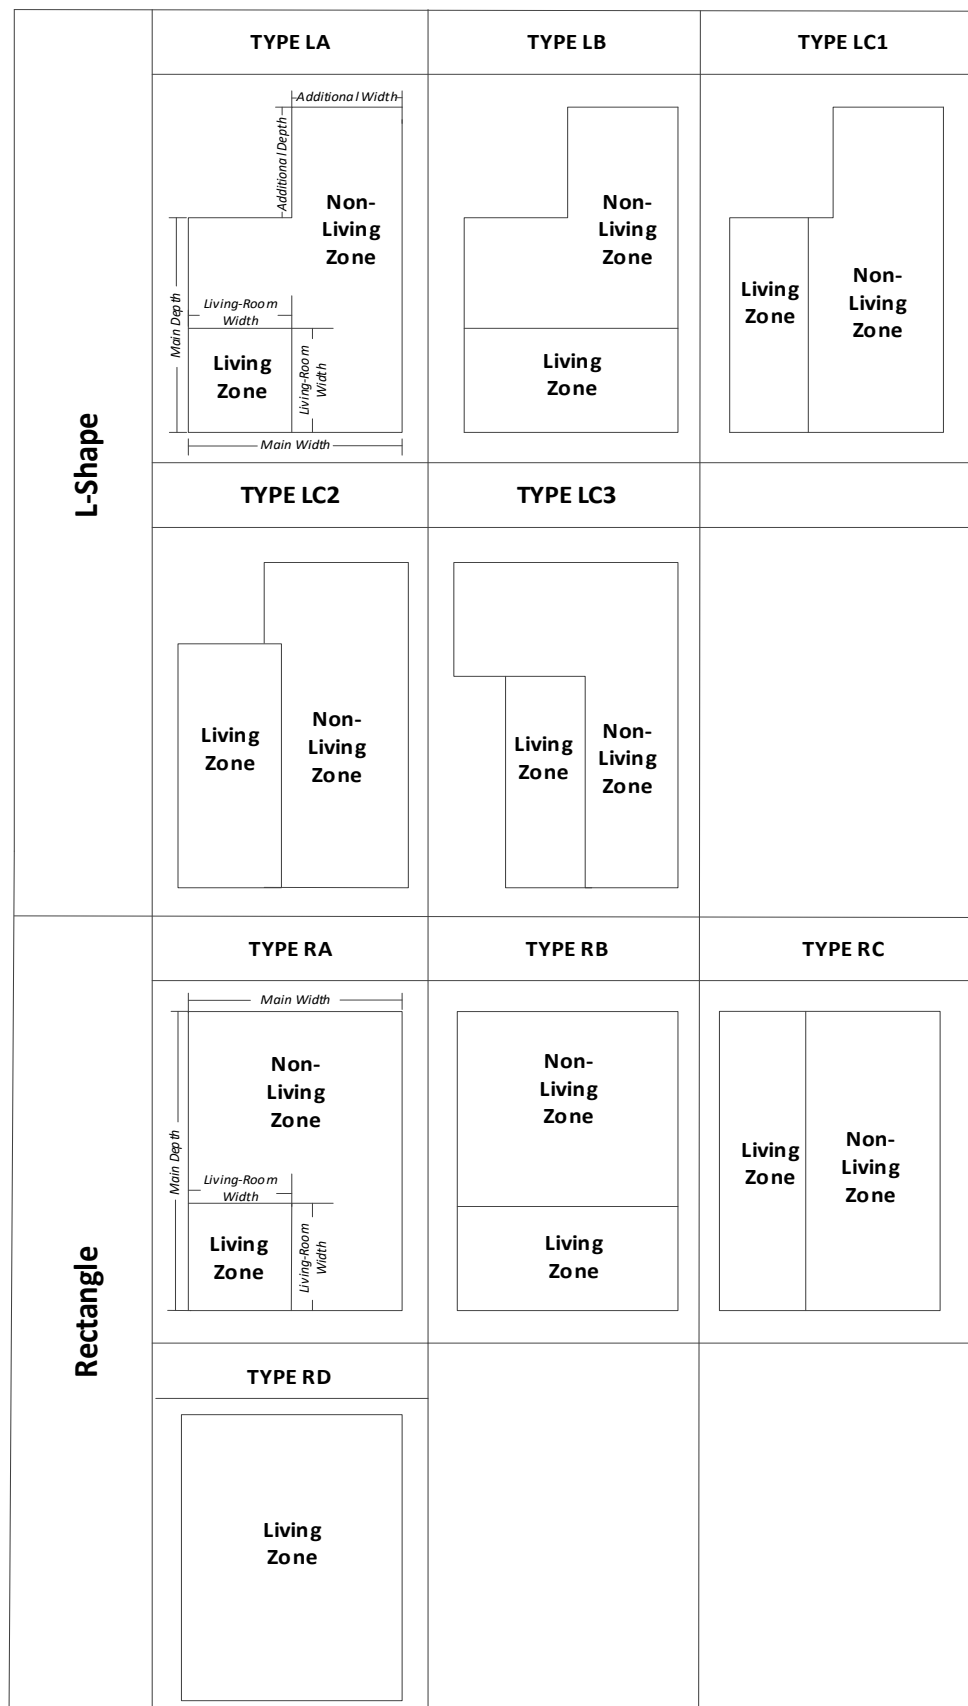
Ground-floor layout variations for rectangle and L-shaped house archetypes
